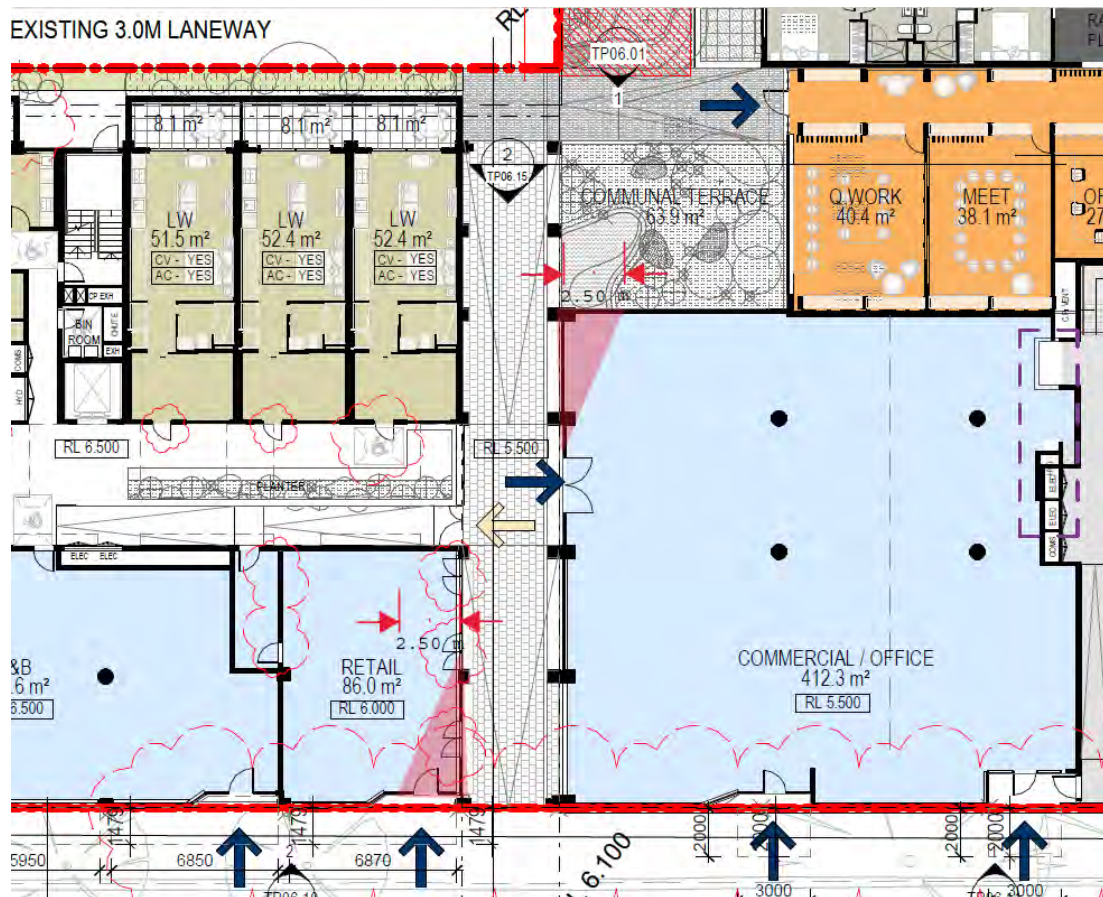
Marked up Ground Level Plan showing potential localised widening of the pedestrian arcade
